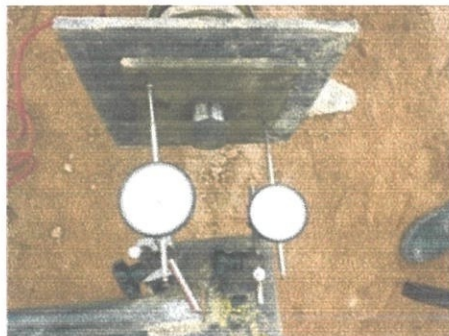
Soil nail pull-out test equipment. (Draw-off tower)
